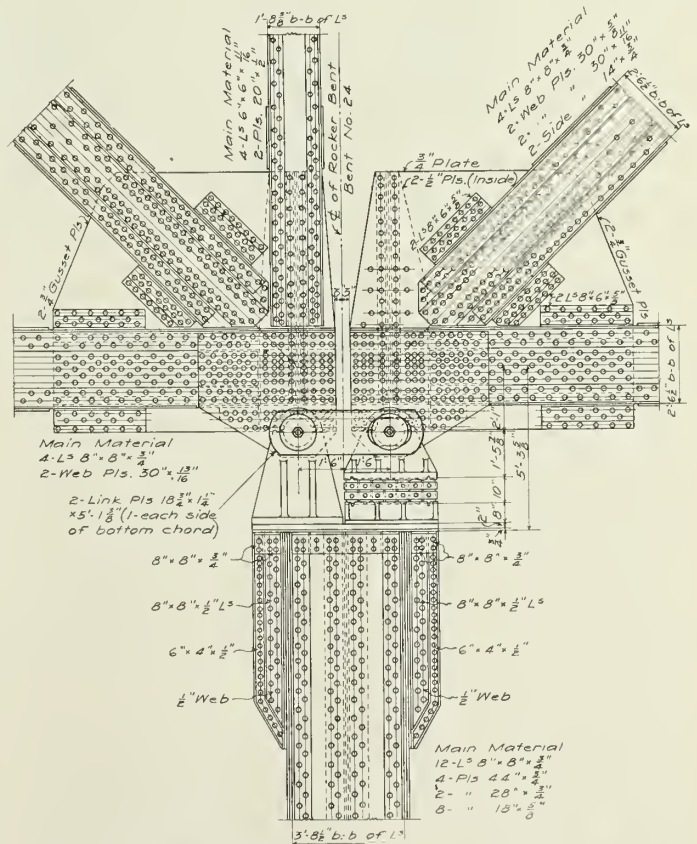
Longitudinal View Showing Top of Rocker Bent and Bearings of Truss Span.
